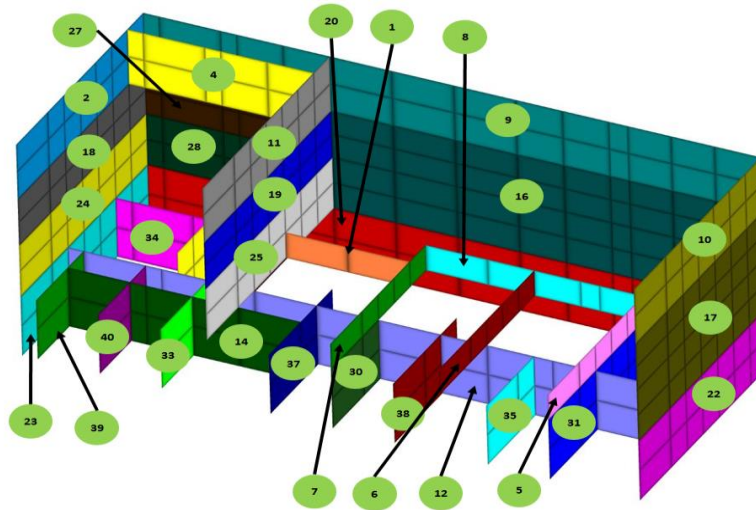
Low-Rise Reinforced Concrete Shearwall Building Nonlinear Model With 40 Wall Panels
